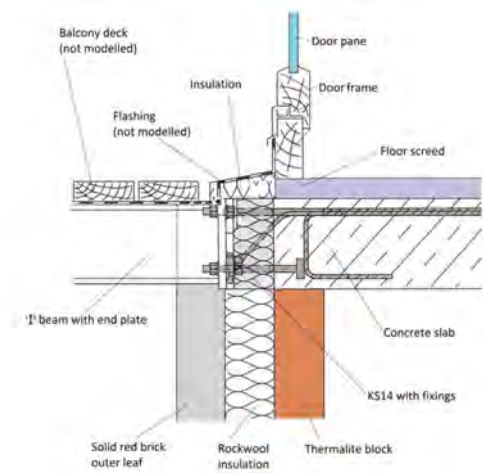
Schöck KS14 unit used with masonry wall and concrete slab
